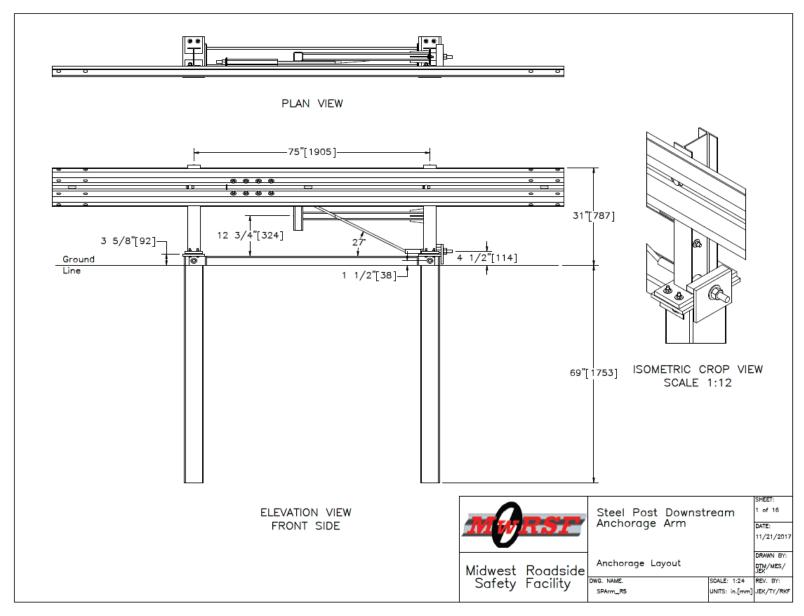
T-Shaped, Breaker Bar Design – Anchorage Layout
